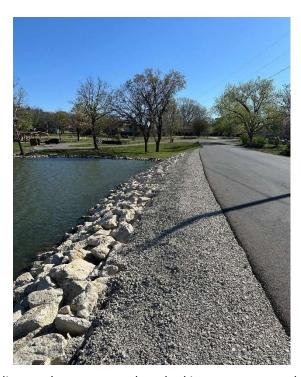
Standing on the upstream slope looking at upstream abutment contact.
